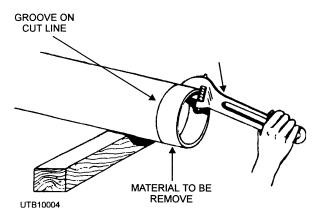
Cutting cast-iron pipe with hacksaw and adjustable wrench.
